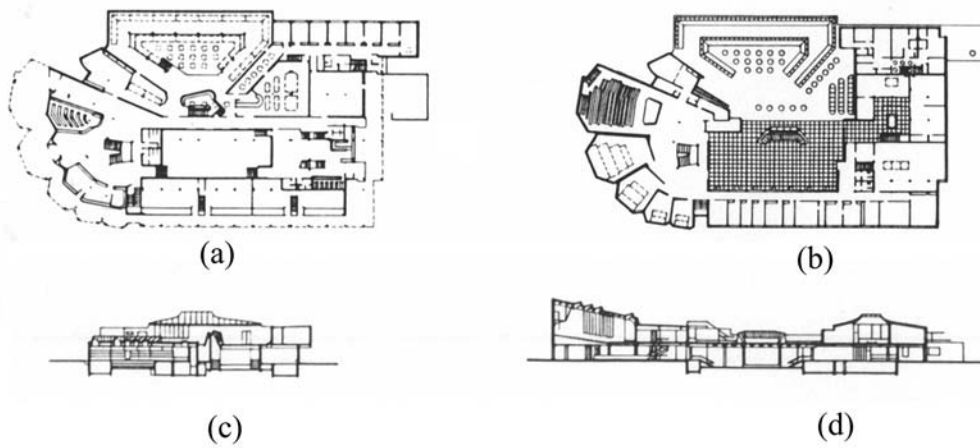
Cultural Center Building by Arch. Alvar Aalto, Wolfburg, Germany, 1962. (a) lower floor plan; (b) upper floor plan; (c) transversal section; (d) longitudinal section.
